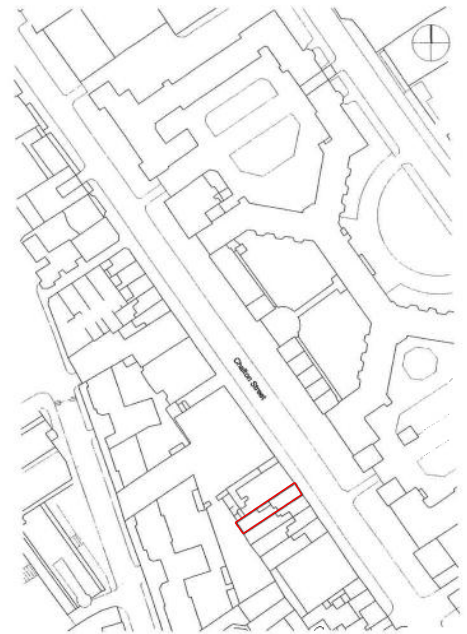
Proposed drawing for planning app ref: 2020/3950/P (not to scale)
